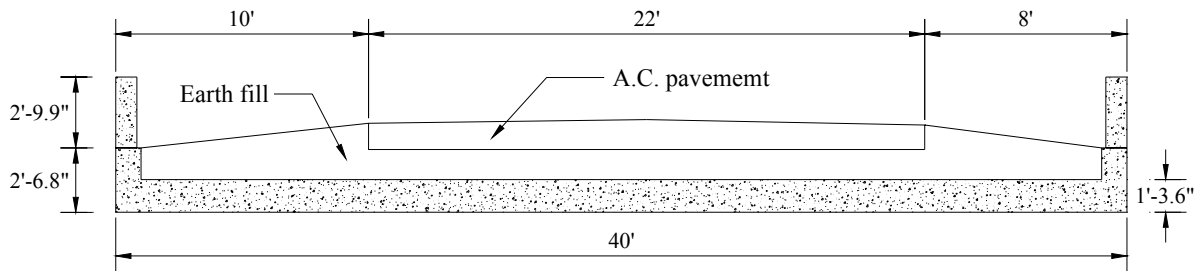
Bridge #6: Cross-section of the bridge at midspan.
